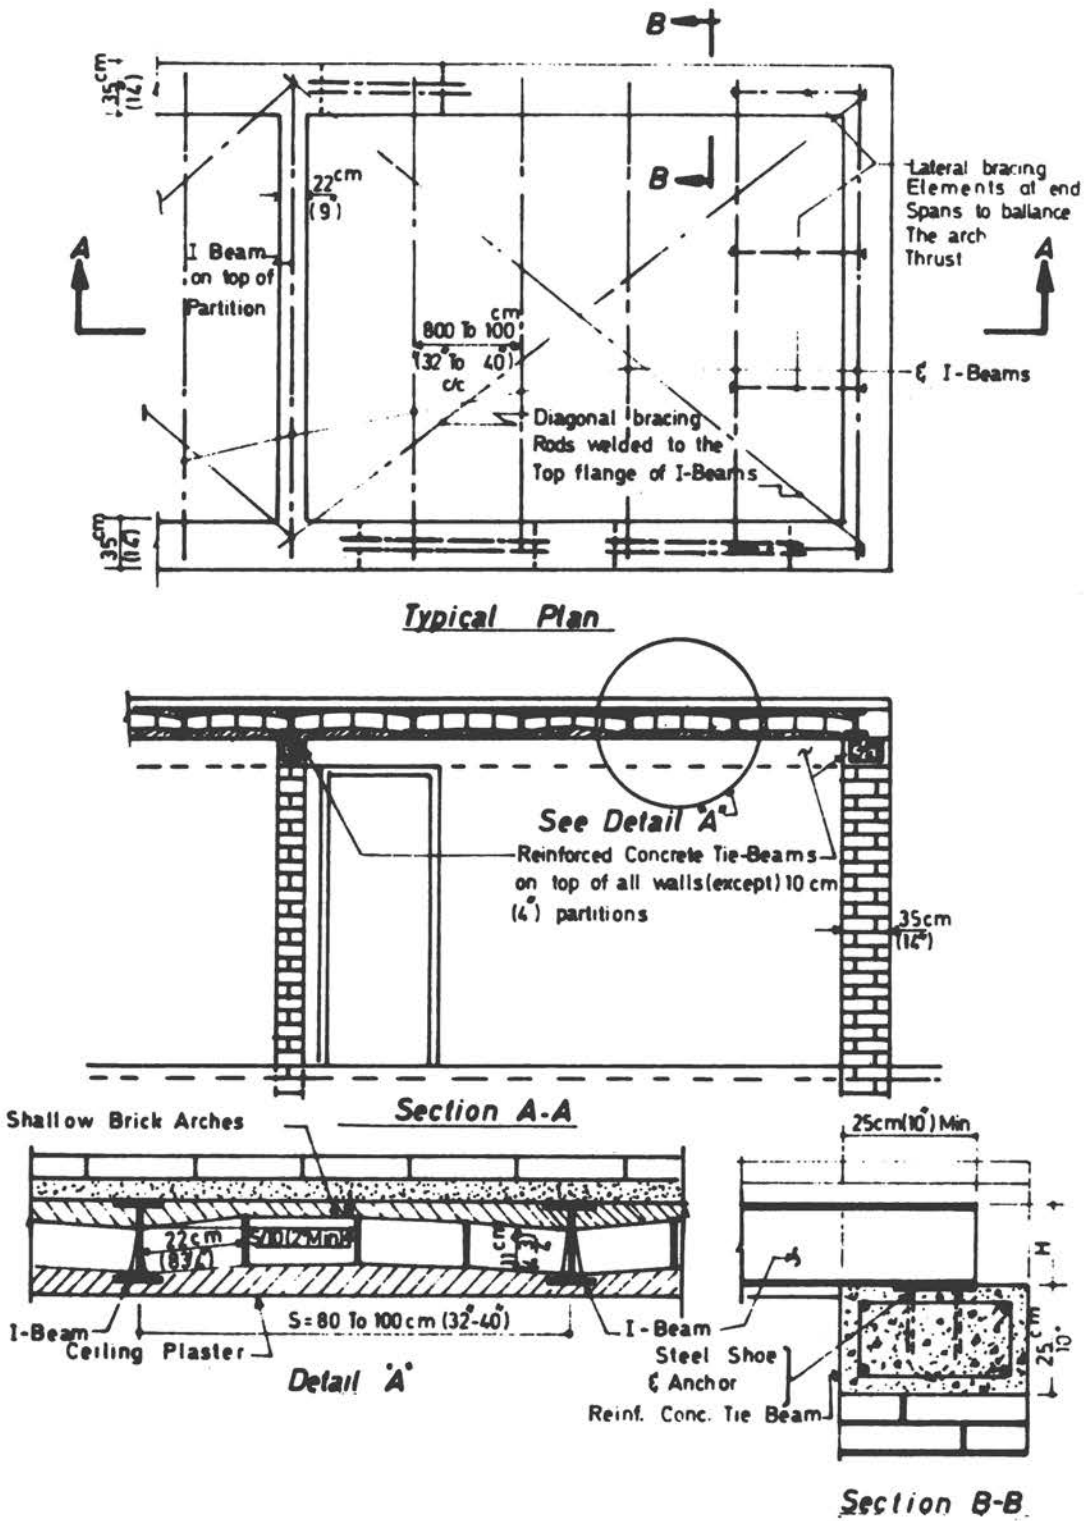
Typical Details of the Popular Iranian Roofing System Made of Steel I-beams and Shallow Brick Arches (SBABA Roofing System).
